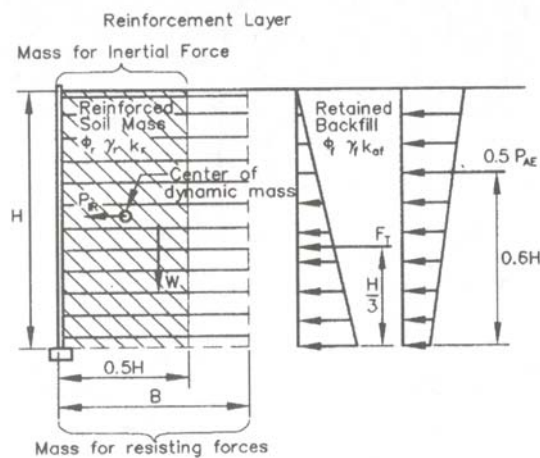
AASHTO Figure 11.10.7.1-1a - Seismic External Stability of a MSE Wall, Level Backfill Condition
